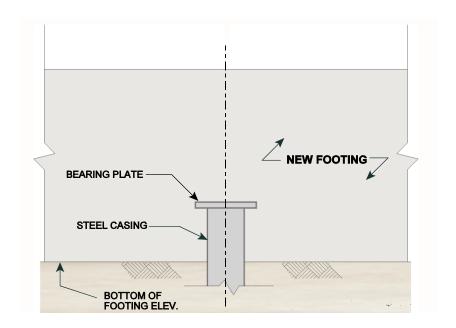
11. Pile to New Footing Connection Detail – Simple Compression, High Load.
